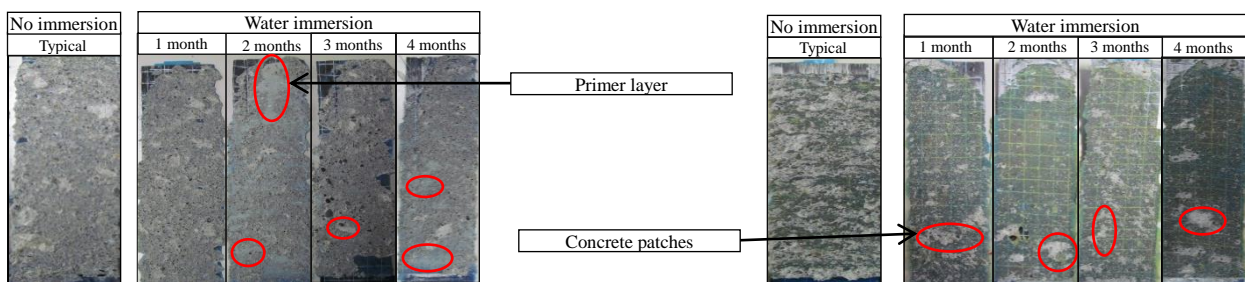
Failure surfaces for type-E bond specimens (left) and type-F bond specimens (right) for both non immersion and immersion cases
